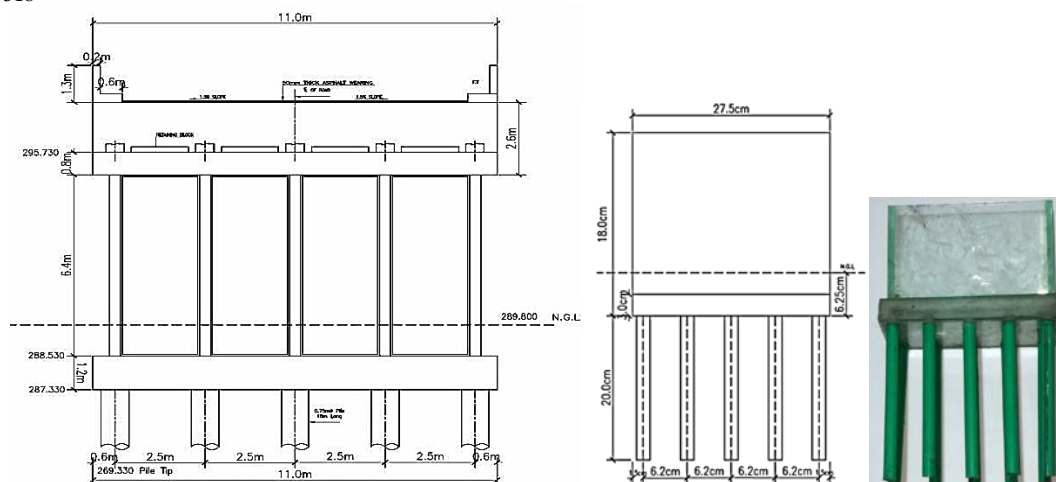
Pushtoon Garhi Bridge Wing-wall Abutment Prototype & Model Detail and Model Picture
